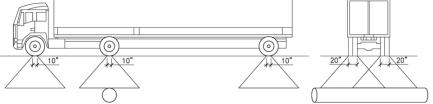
Live Load Distribution Through Fill (Note: Pipe orientation may vary for storm drains)
